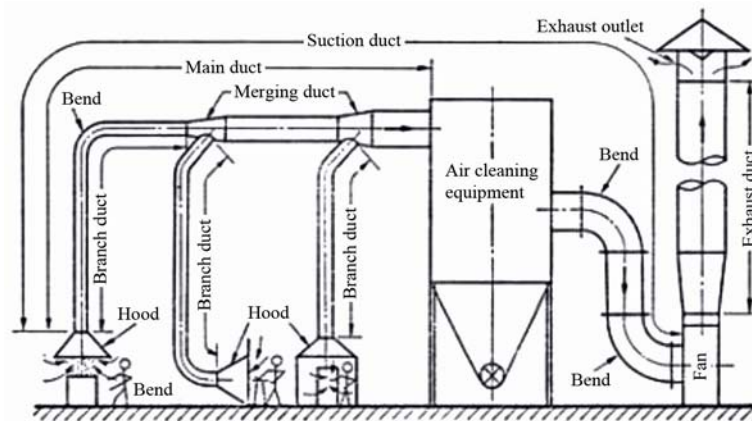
Example of the configuration of local ventilation equipment/air cleaning equipment
